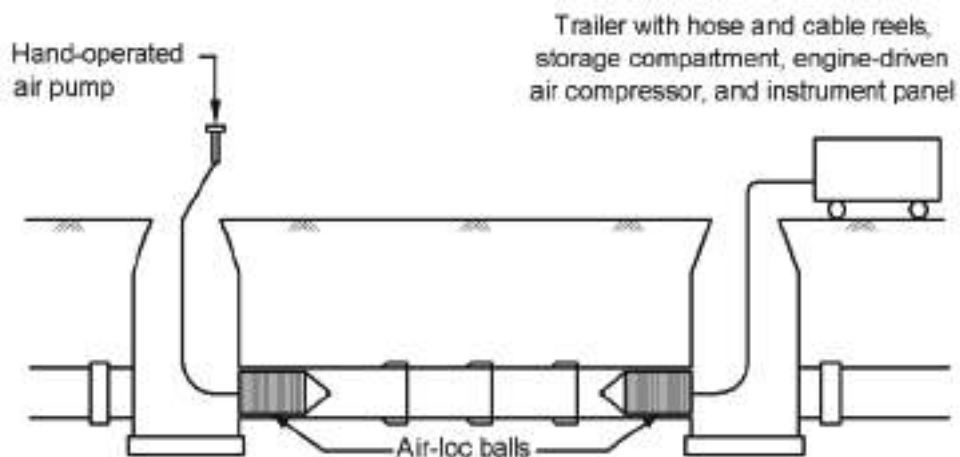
Typical arrangement for low pressure air testing of sewer pipeline
